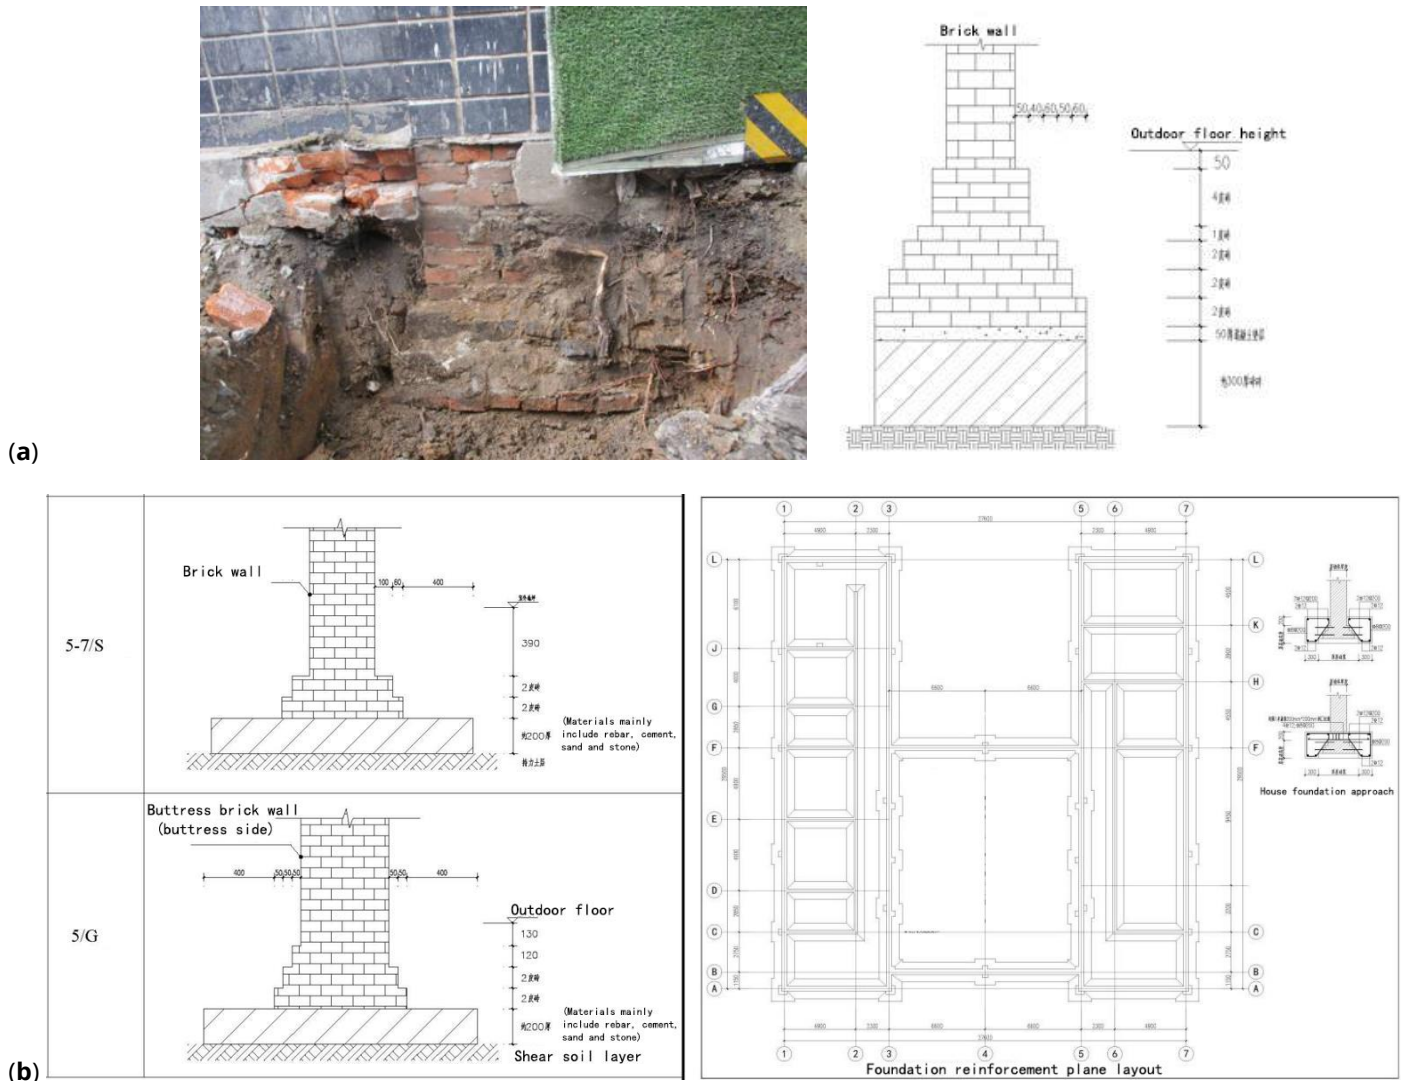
Building foundation reinforcement practices (a) original foundation; (b) the reinforcement design (Source: Zhouqi Studio).
